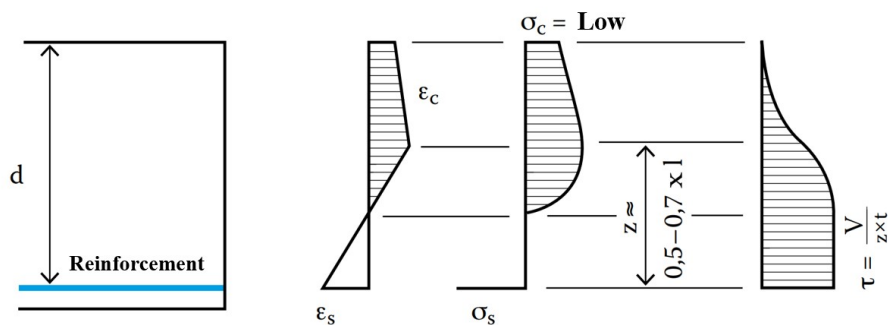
Stresses and strains in cross-section of monolithic concrete floor element subjected to external lateral forces [12]
